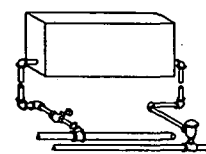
HEATING UNIT WITH VALVES IN BASEMENT
